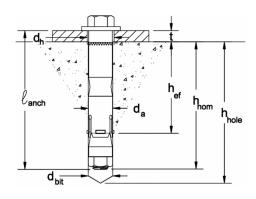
POWER-BOLT+ ANCHOR DETAIL
